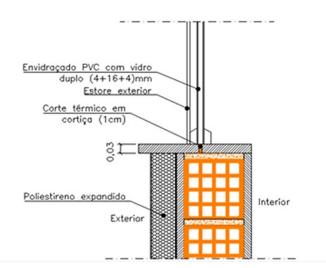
Constructive wall detail with ETICS system, sill and glazing [1]
